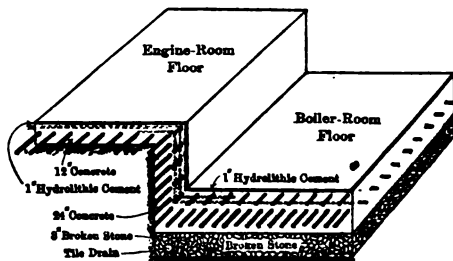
Reinforced-concrete Floor with Water-proof Cement
